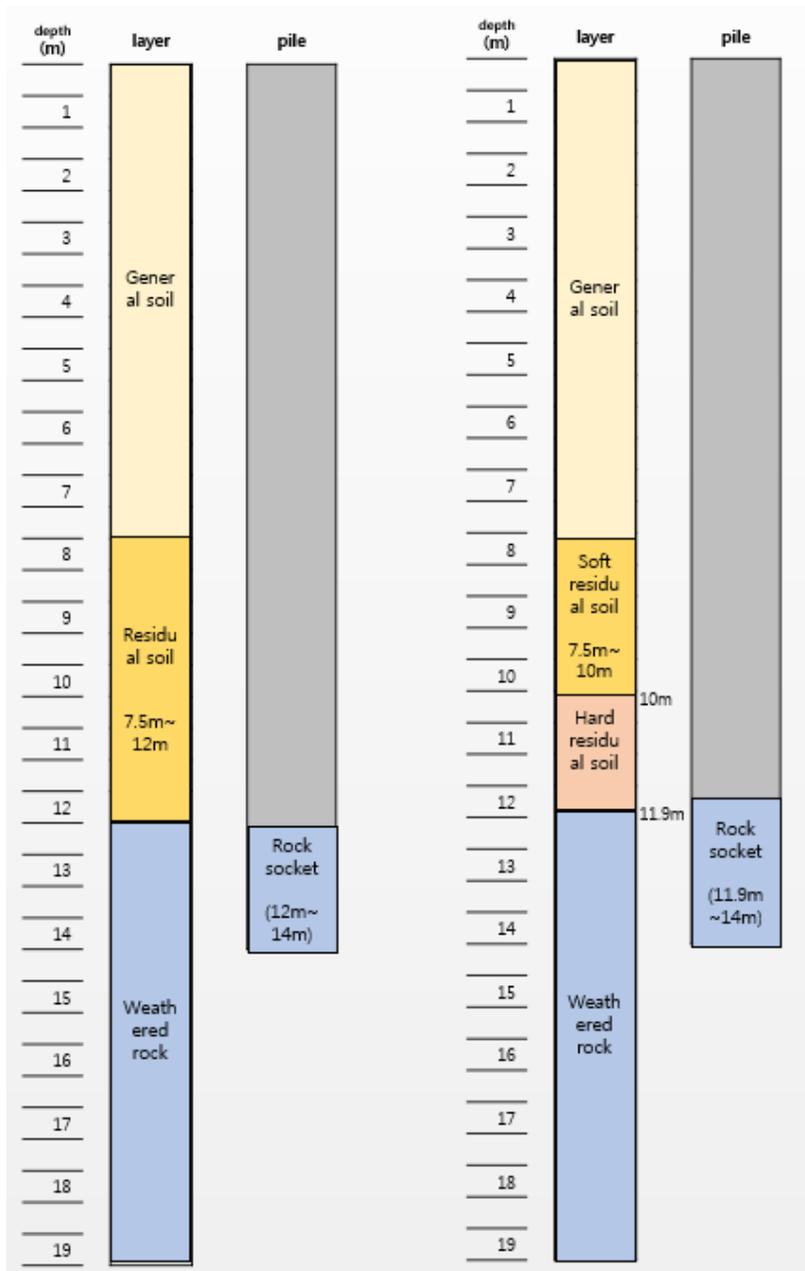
Section view of the subsurface layer for pile No. 2 before and after Modification
